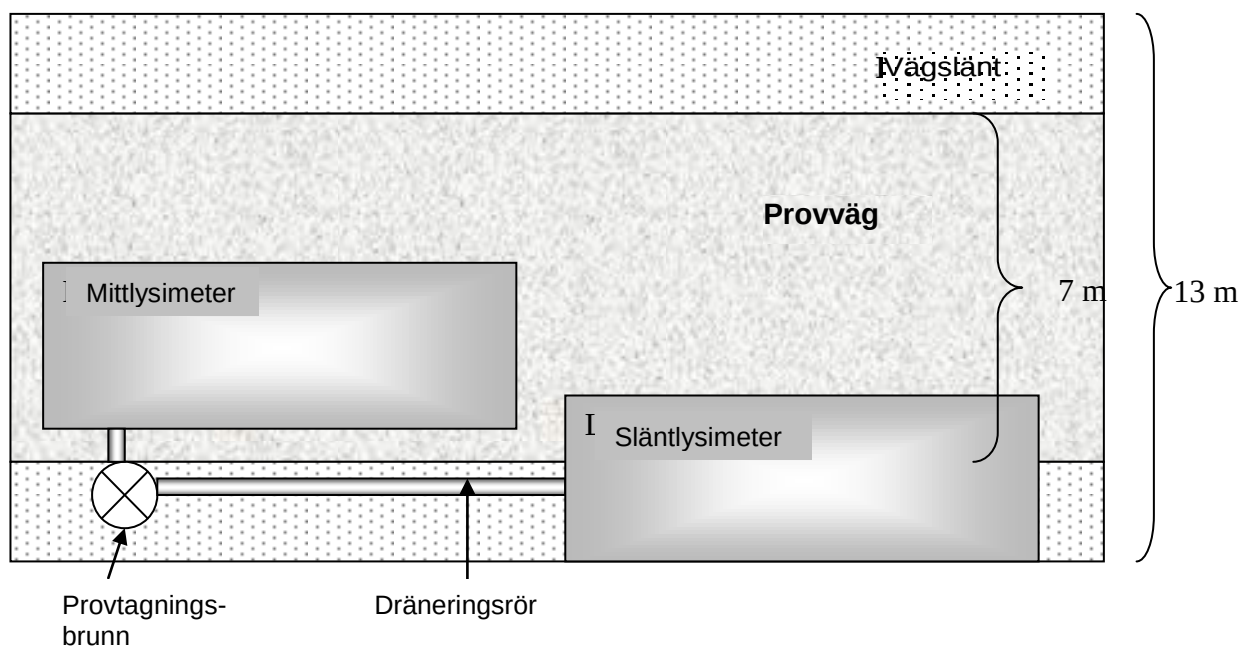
Dåva test road, original installation of groundwater pipes within and along the road (after [12]).
